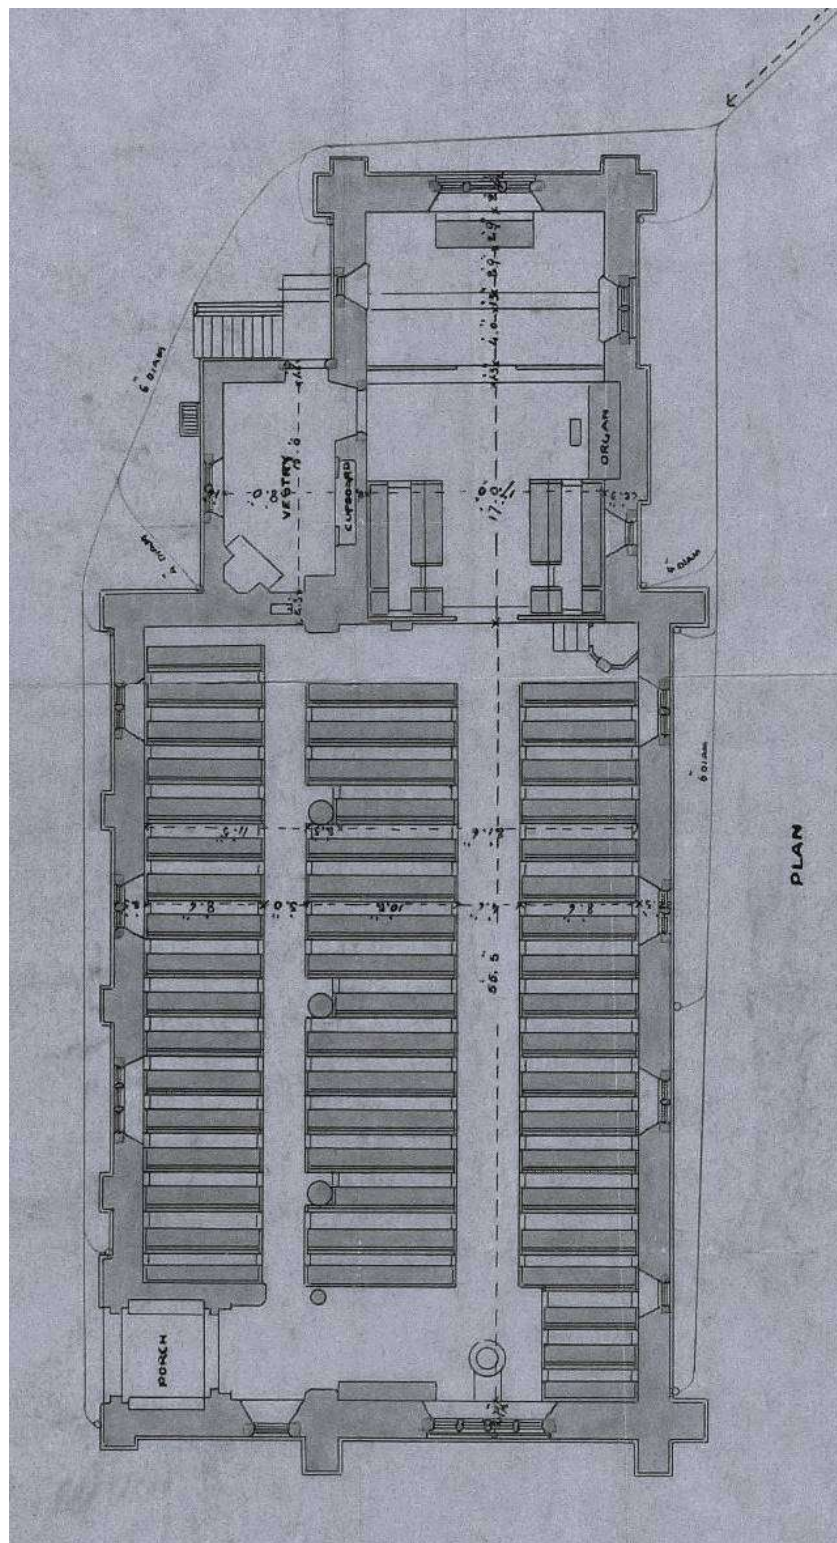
| Church Plan (not to scale - C Hodgson Fowler, Architect – 1865 -1869)
